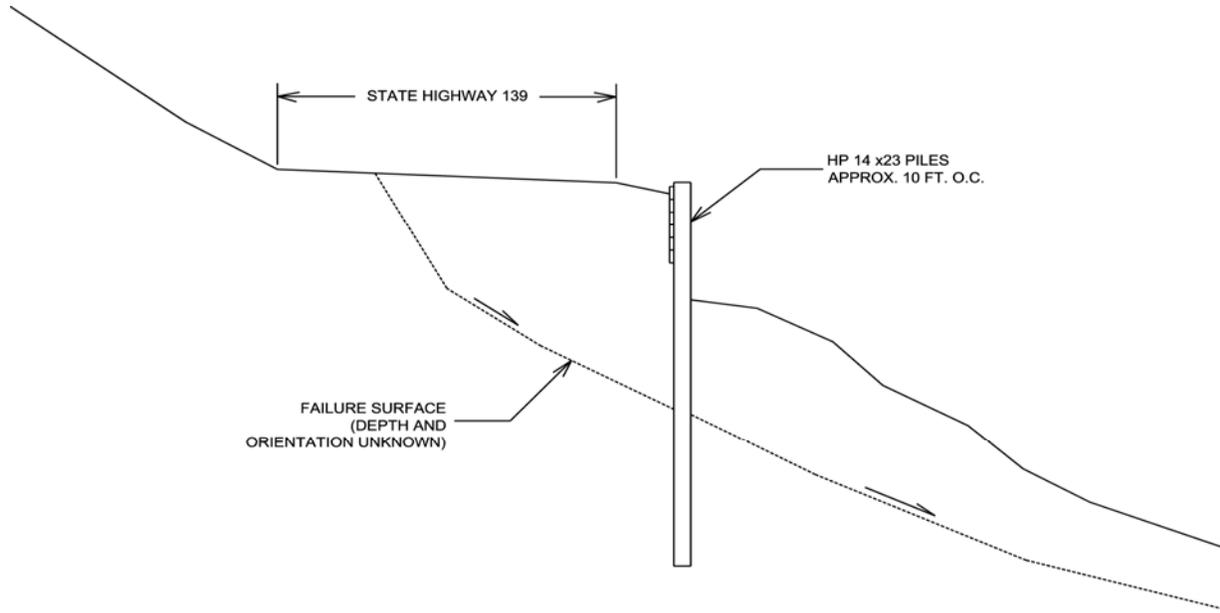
FIGURE \_\_\_ - SCHEMATIC OF SH 139 DOUGLASS PASS SLIDE REPAIR. (LENGTH OF PILES AND PENETRATION BELOW FAILURE SURFACE ARE NOT KNOWN.)
